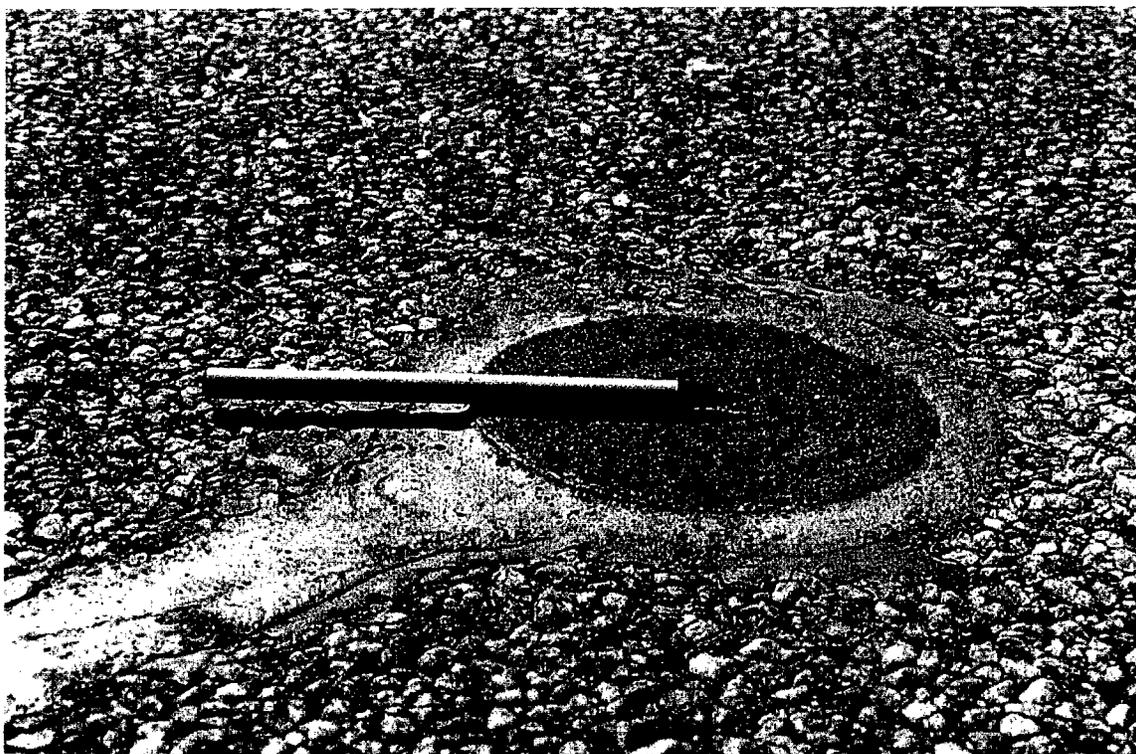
East pavement sensor at Pathfinder Hill protrudes above road surface (8/15/98).
